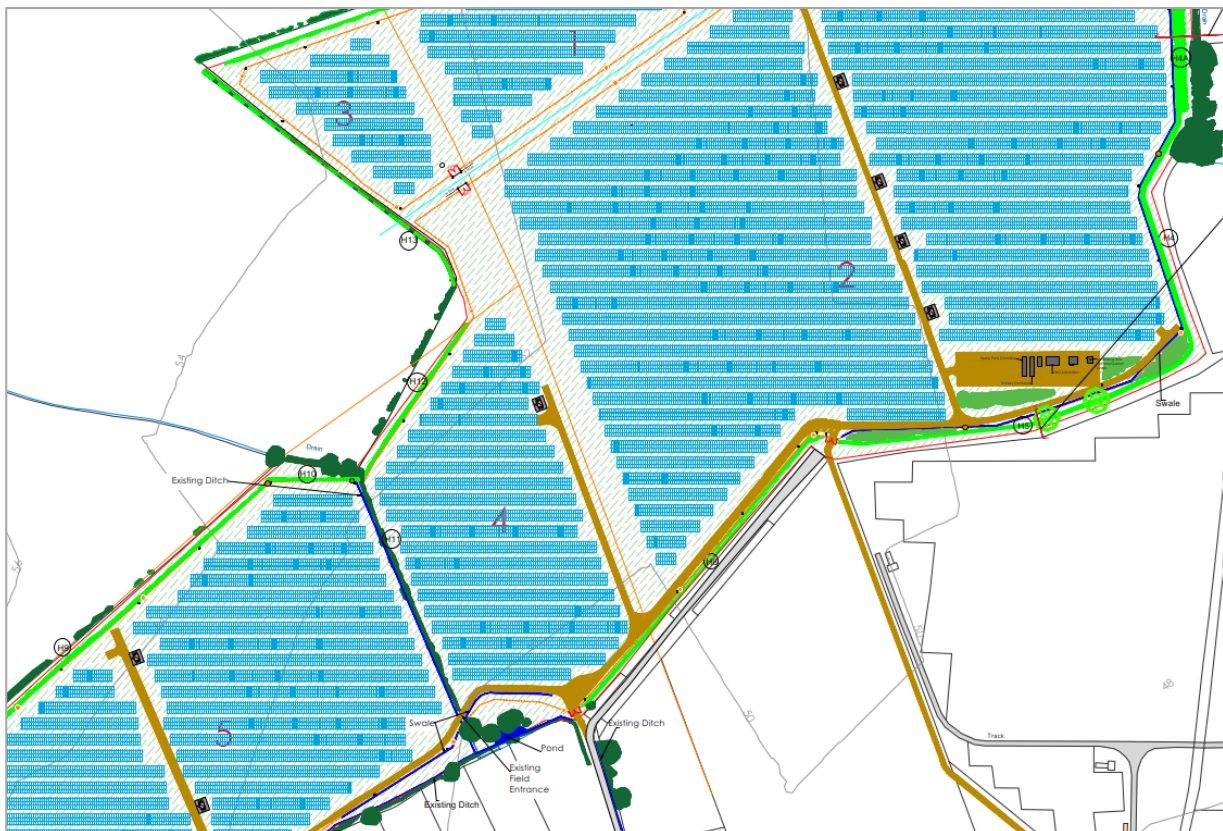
Extract of Greentech Site Landscape Plan Rev. 9 showing ditches and proposed swales
